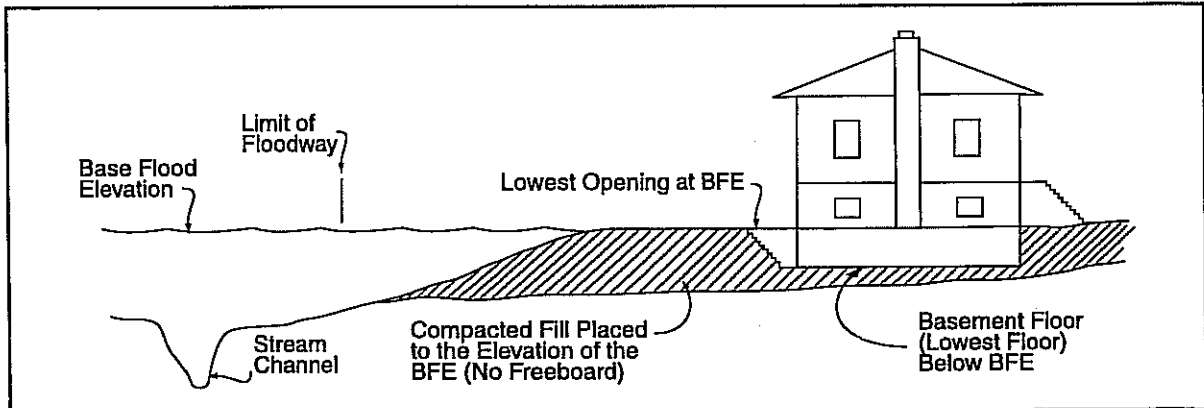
Basement foundation with lowest opening at the BFE. The basement is exposed to flooding from any flood greater than the Base Flood.
